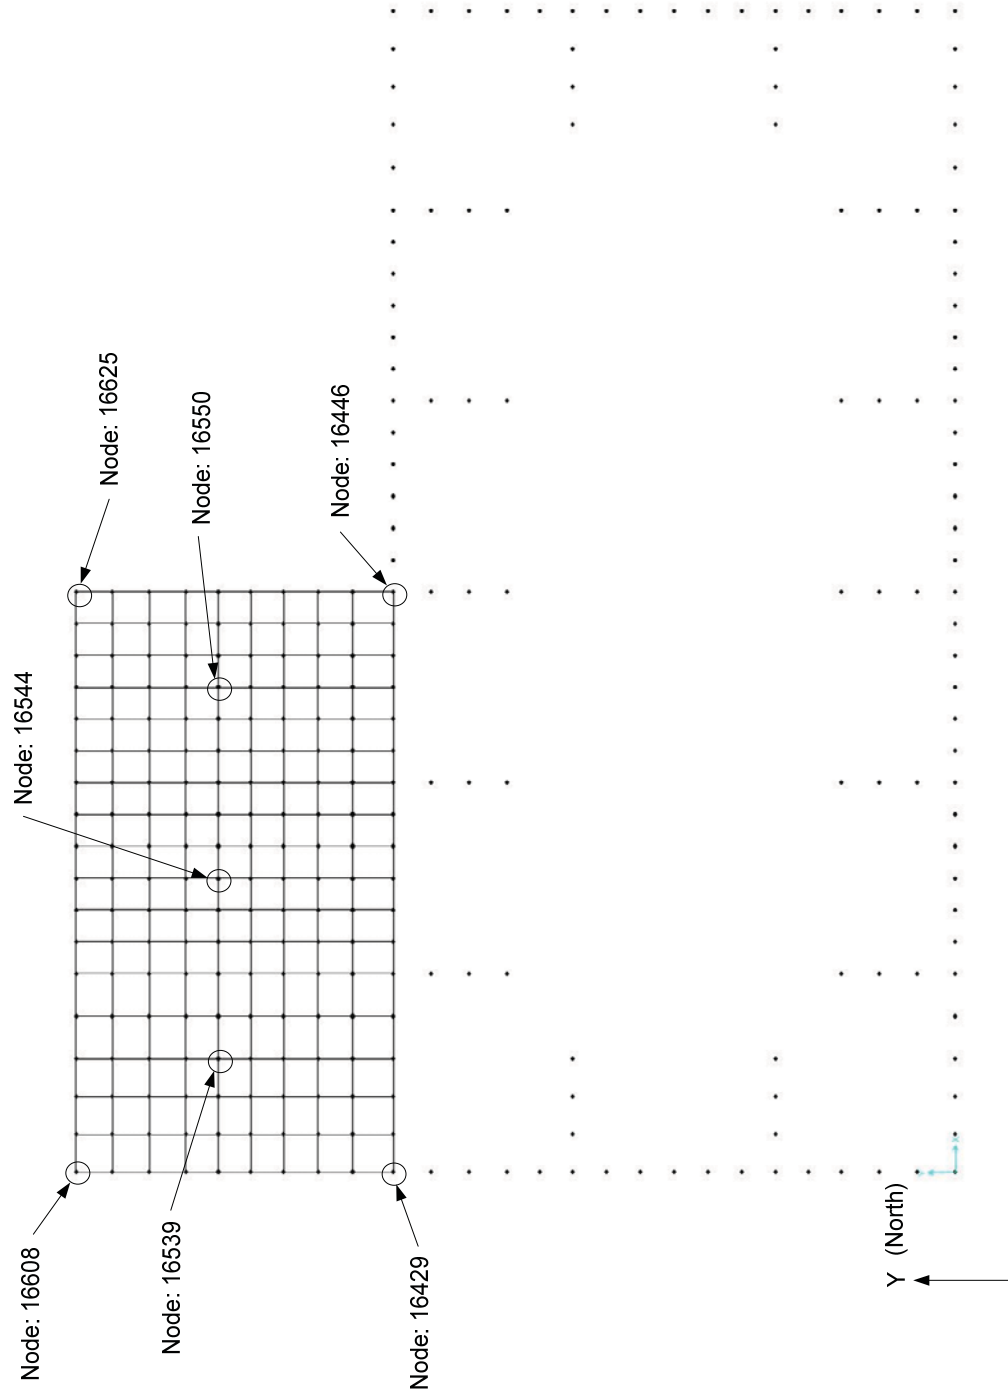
Pump House Roof – STP Elev. 50'-0" (16.86m TMSL)
